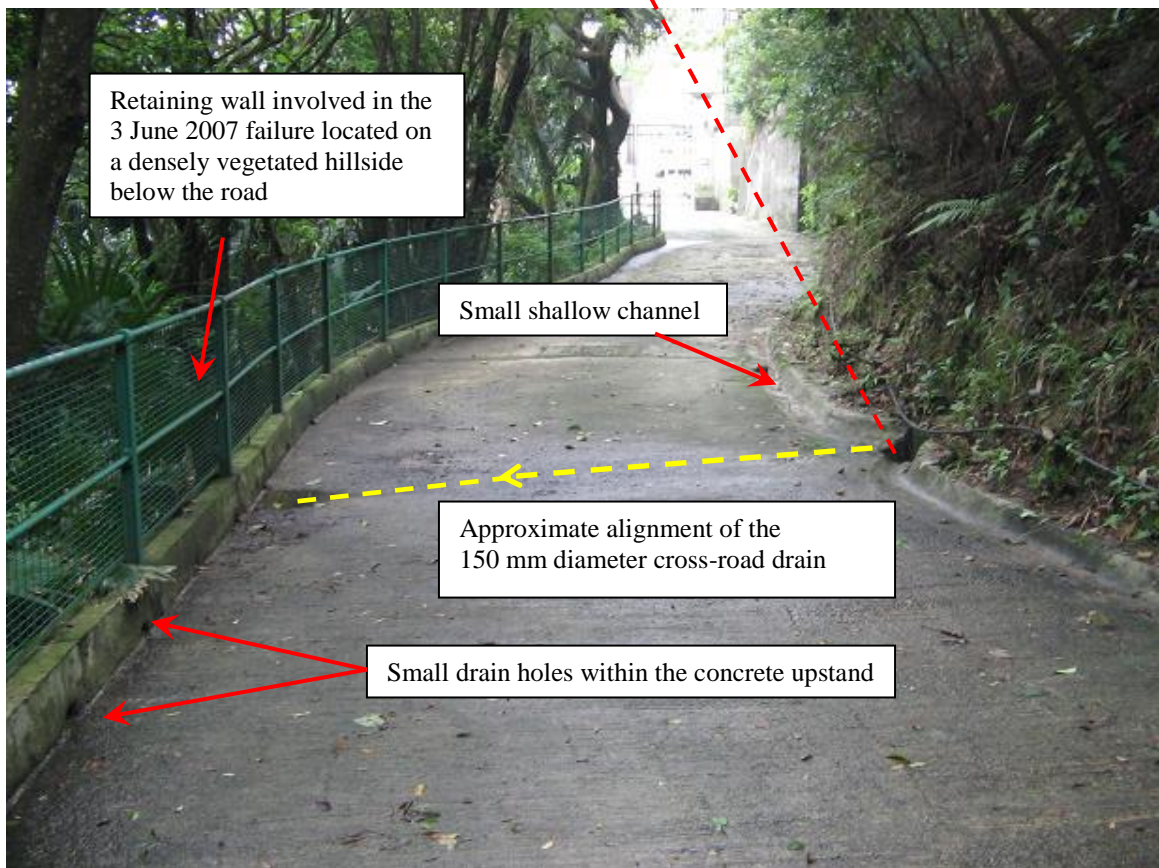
Slope No. 11SW-D/C258 and the Hillside above
